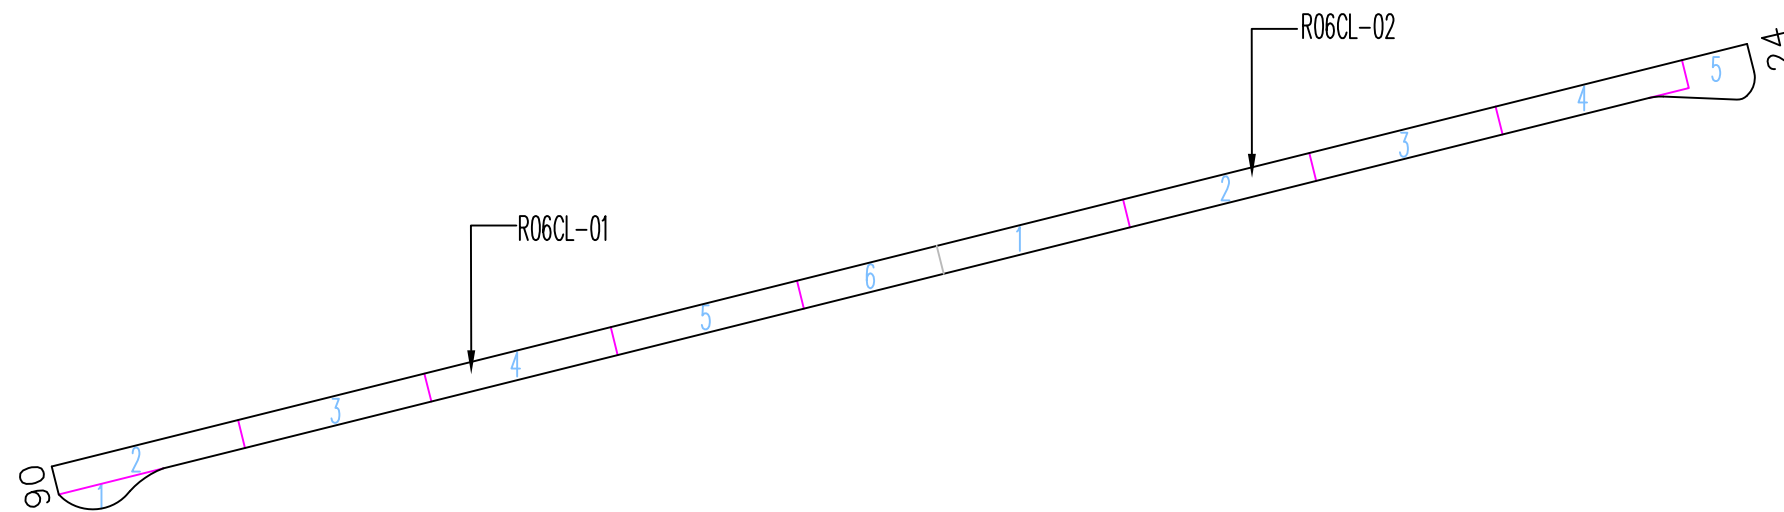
Pavement Branch, Section and Sample Unit Layout.
